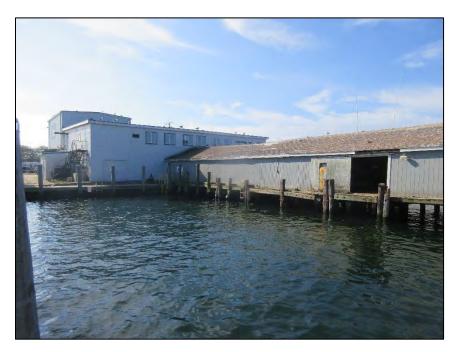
Pier F with missing and/or dislodged exterior chocks. Fenders along the building observed to be damaged and/or missing.
